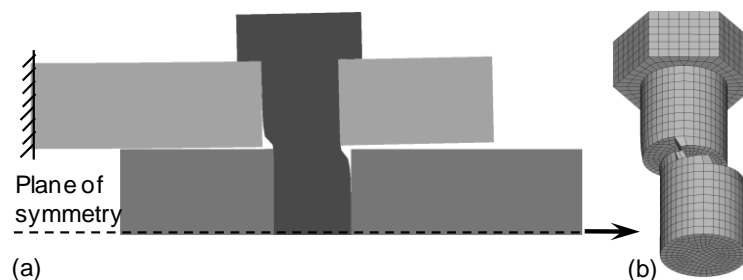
Detailed model of bolt double-shear test: (a) section view at ultimate load; (b) bolt mesh after fracture.
